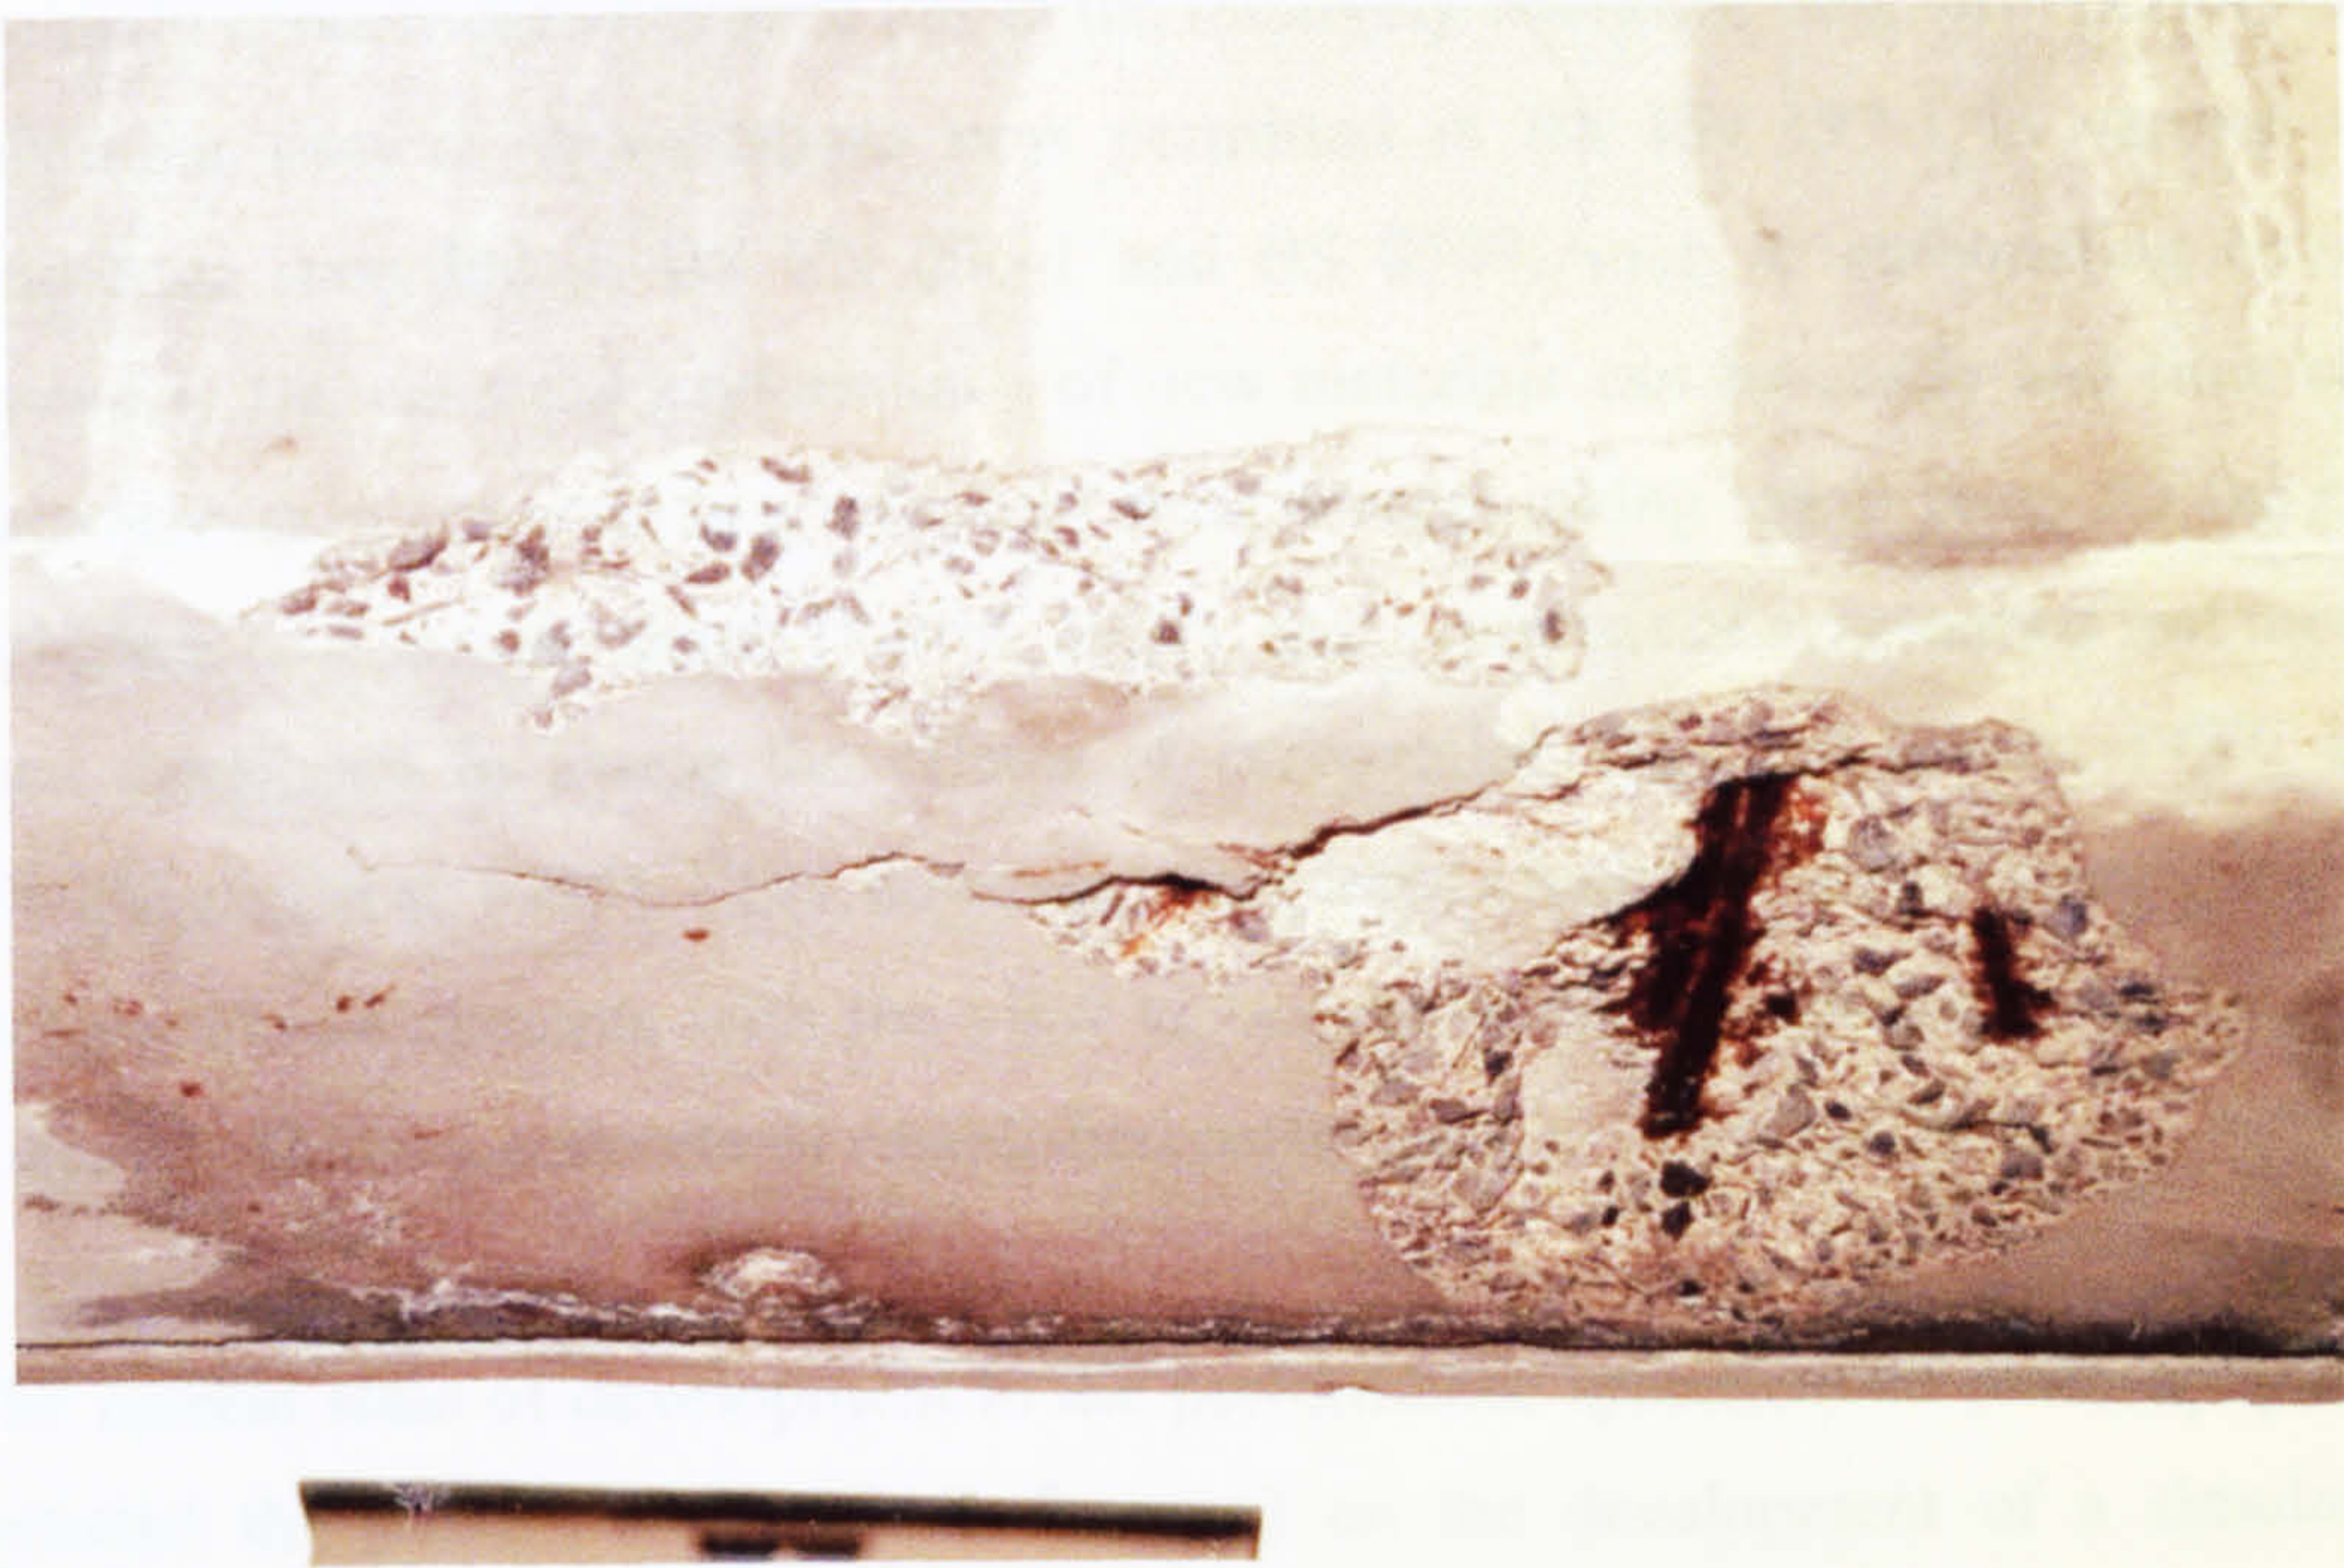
Carbonation-induced corrosion affecting serviceability of a beam. Corrosion has caused extensive spalling of the concrete exposing the steel reinforcement.
